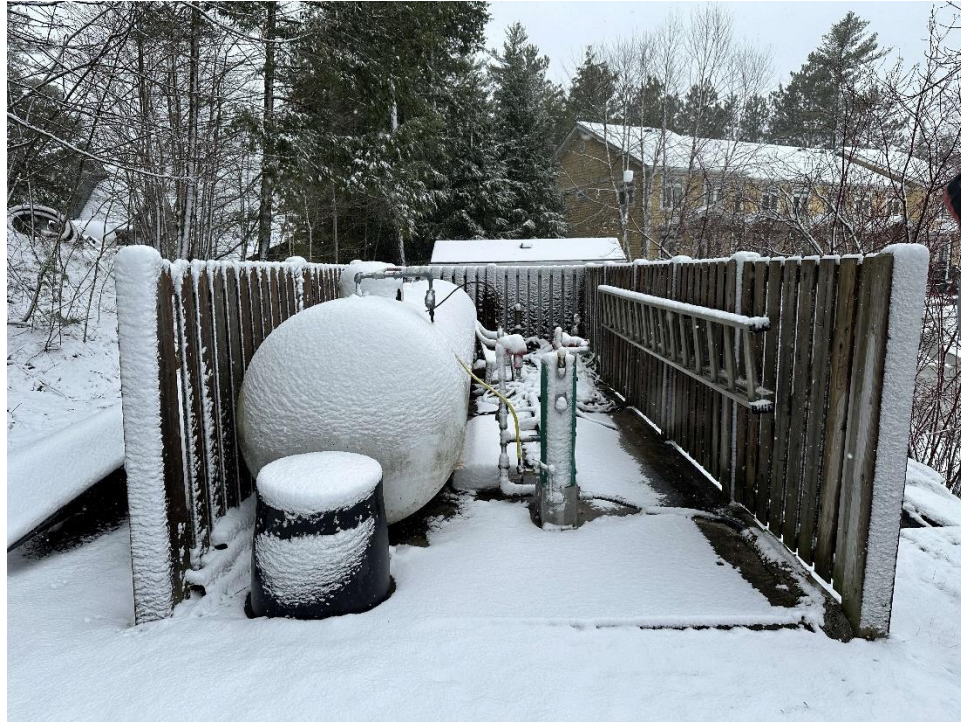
Propane Tank (outside of scope) and Wood Fencing
